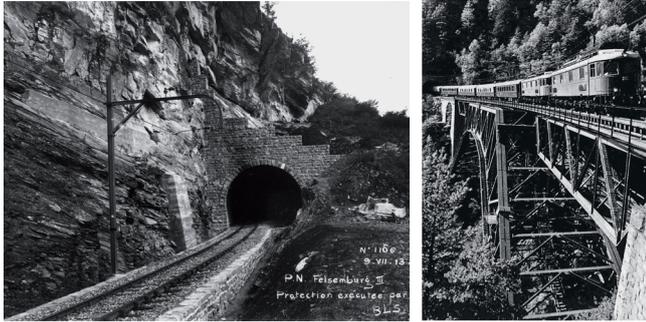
left: Dual-track tunnel excavated on the formerly single-track Lötschberg line (source: BLS)
